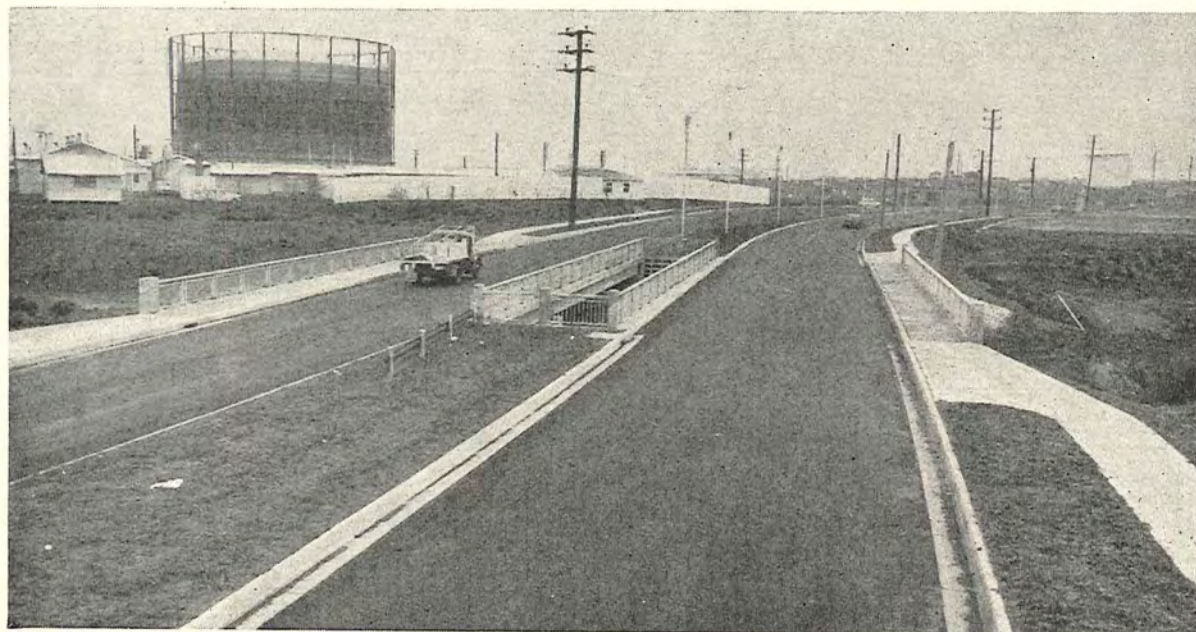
New dual bridges over the Darebin Creek, Murray Road, City of Preston.
